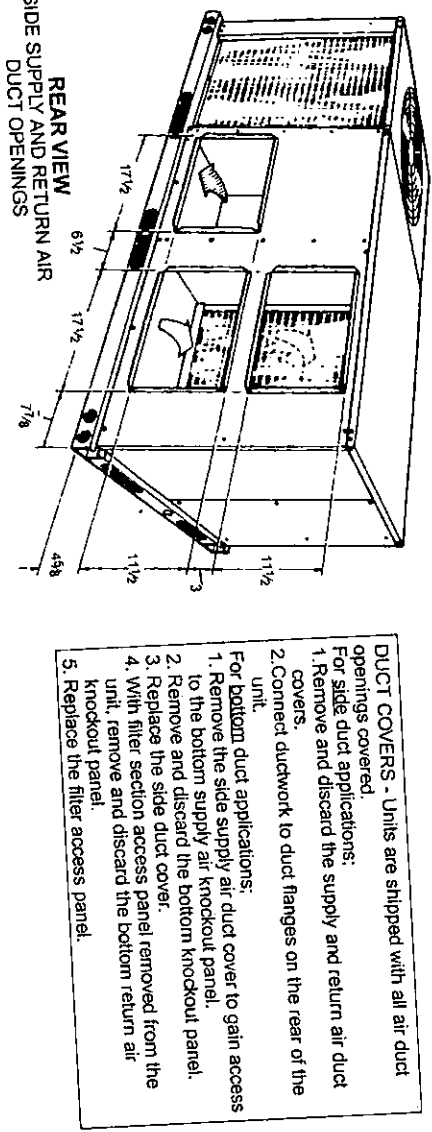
UNIT DIMENSIONS (REAR VIEW)
